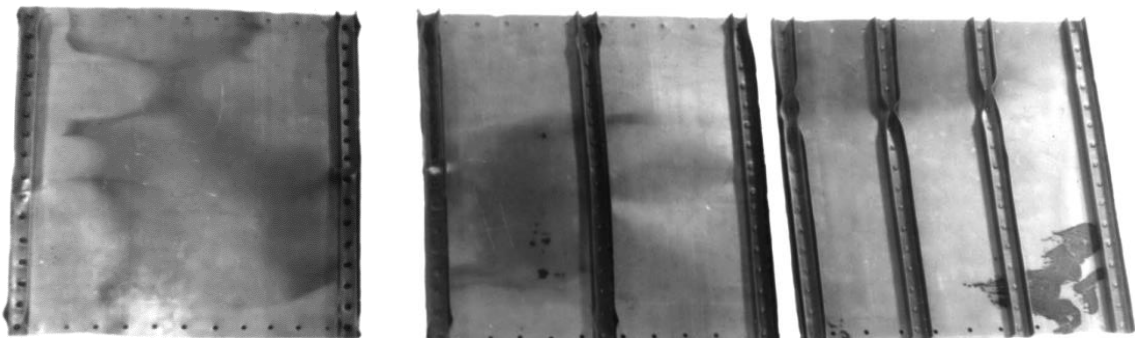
Local failure of stiffener legs (from Gall [100])
